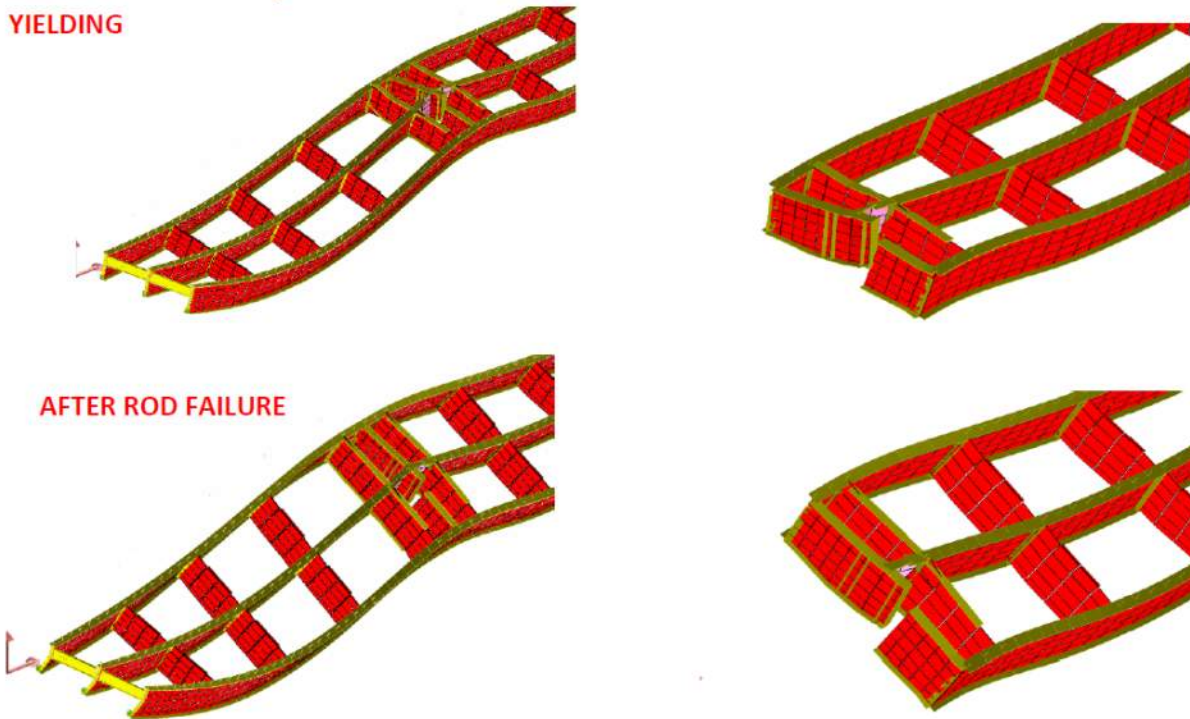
Deflected Shape at Integral Pier Cap – Before and After Anchorage Failure (Deck not shown for clarity)
